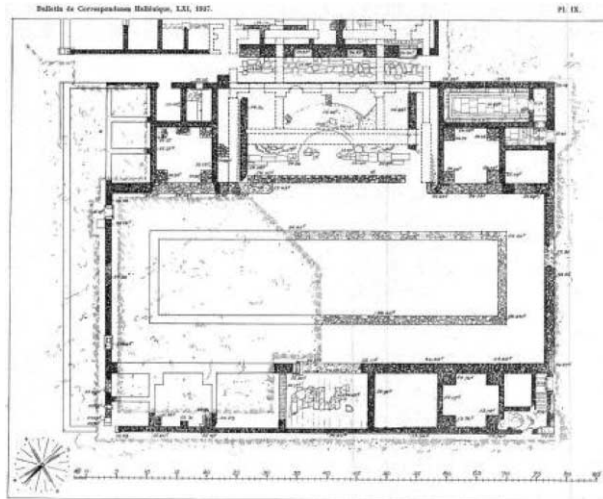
Gymnasion of Philippoi, ground plan (Lemerle, 1937)
